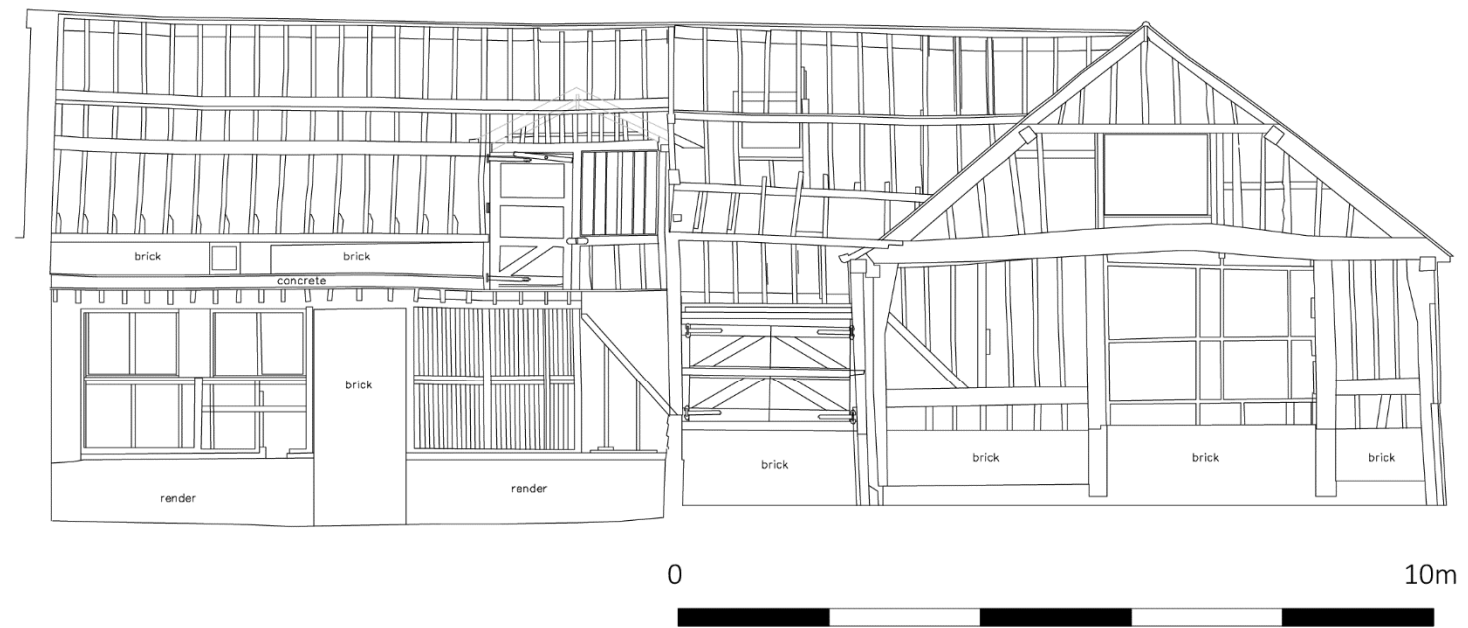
Barn 1, south and north internal elevations (scale 1:100)
